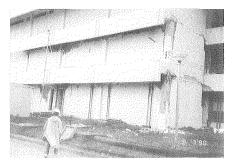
The burnt out Baguio Export Processing Zone (EPZA) South building
